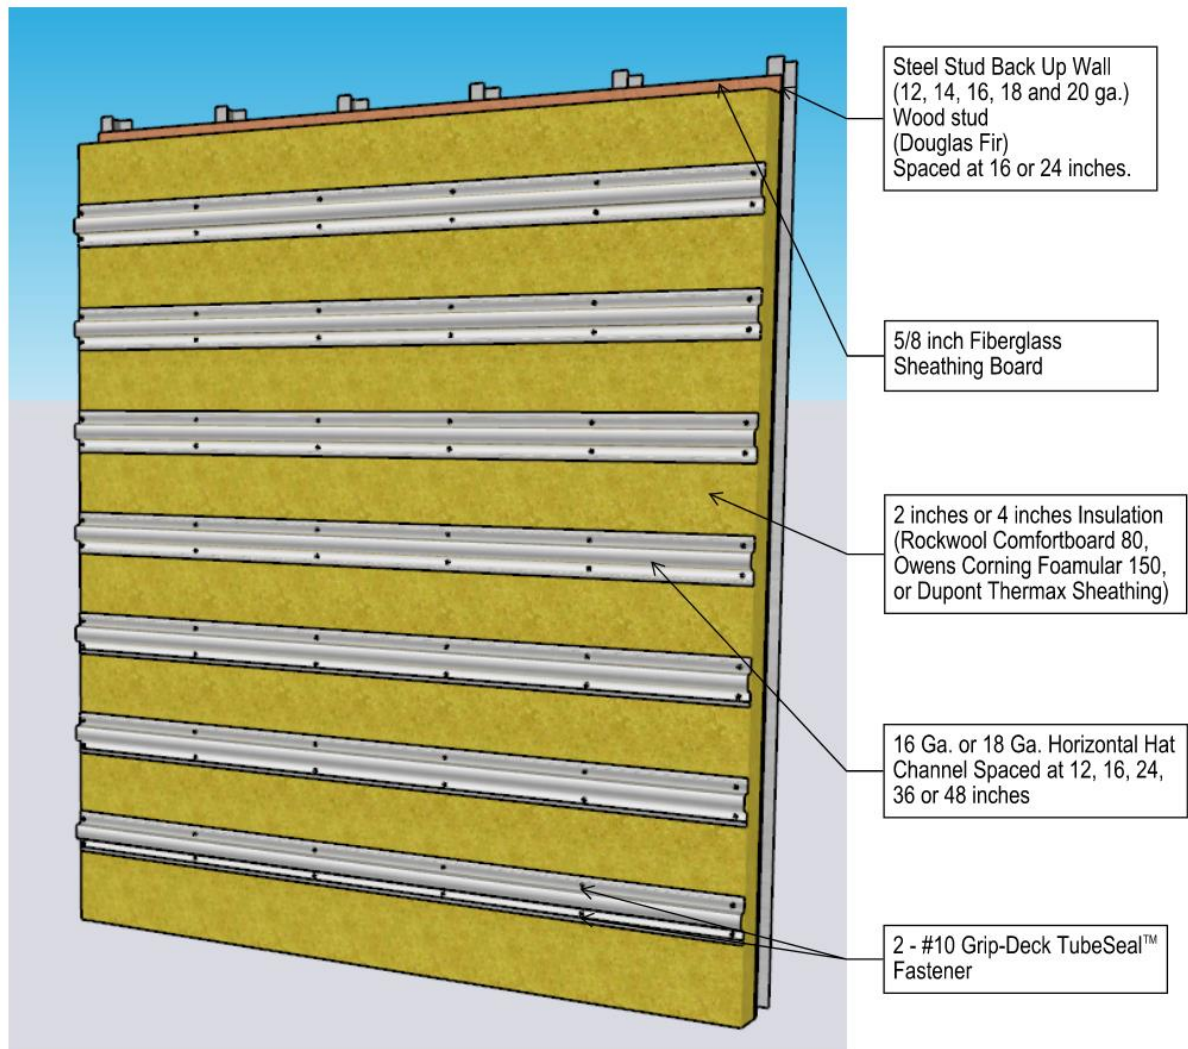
Horizontally aligned hat channel system on steel stud wall.
